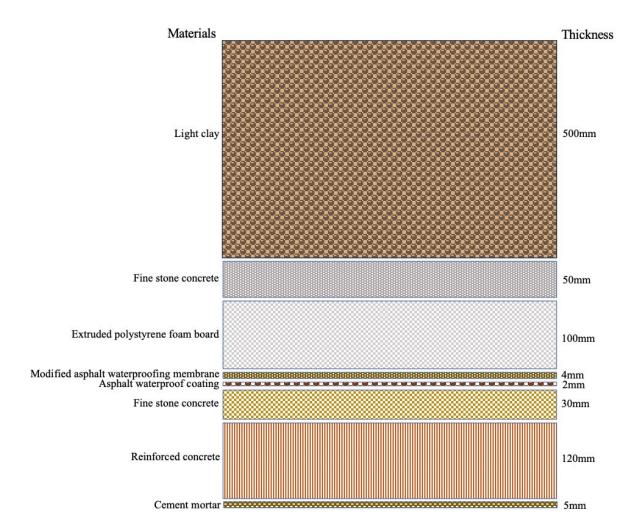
Diagram of roof construction elements regarding the studied educational building (Source: drawn by the author.)
